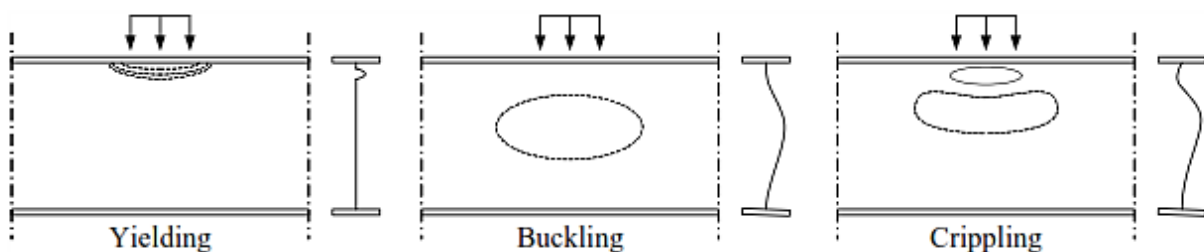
Schematic failure modes for girders subjected to patch loading.
